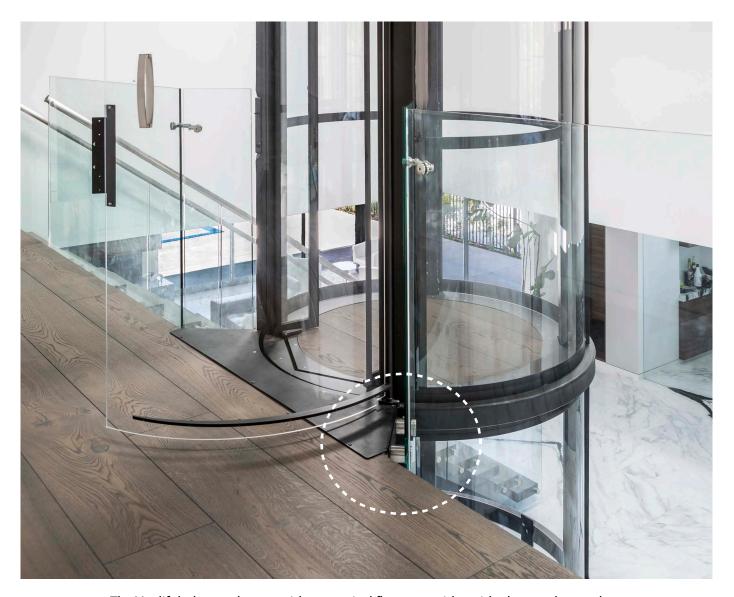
Balcony plate and handrail information - round+ glass (RGL) type 1 shown
